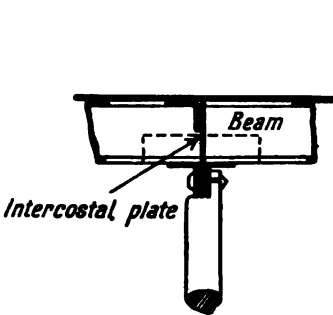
Another excellent method of supporting Steel Decks in conjunction with Pillars.
